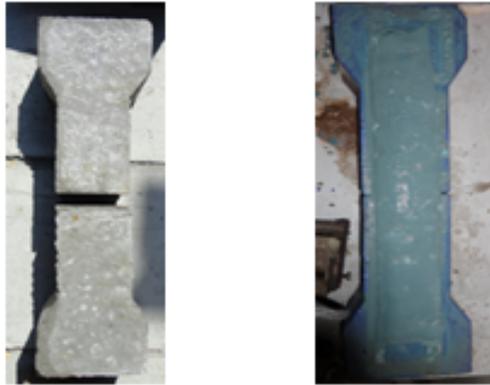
Casted Concrete Specimen (Left) and SFRG Coated Specimen (Right)
